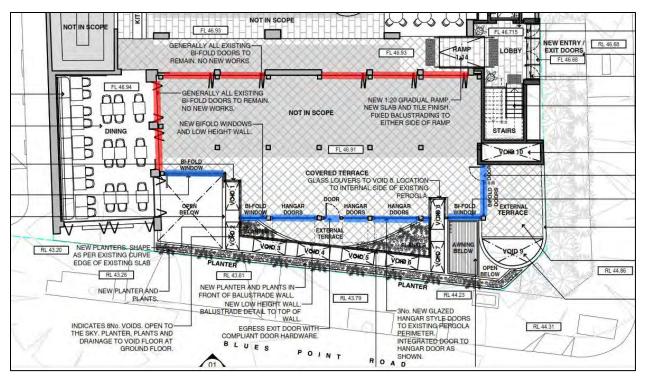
Bi-fold windows and doors to close at 10pm (red) and 12 midnight (blue) (Source: Design Collaborative/Paul Kelly Design)
